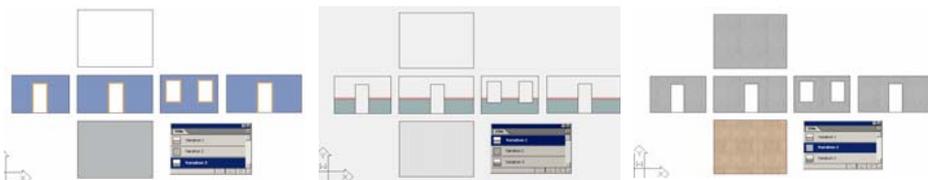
Coloured Architecture: Interior wall and floor/ceiling elevations showing different colour scheme proposals based upon predefined space-colour-profiles. (Belvederer Allee 1, Bauhaus Universität Weimar, 2004).
